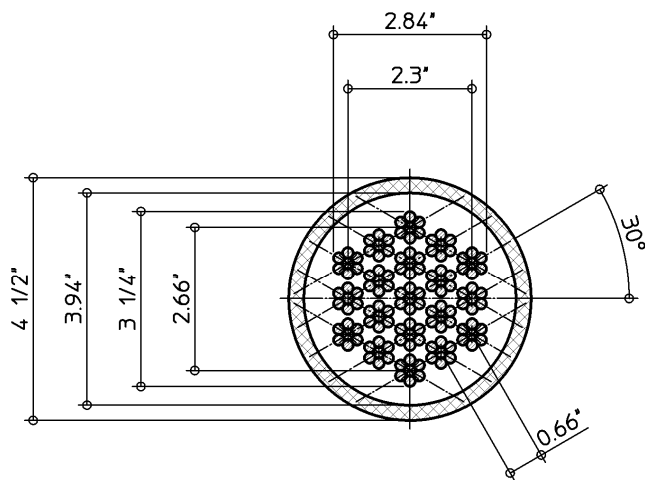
Anchorage Elements of the Stay Cable Specimen
